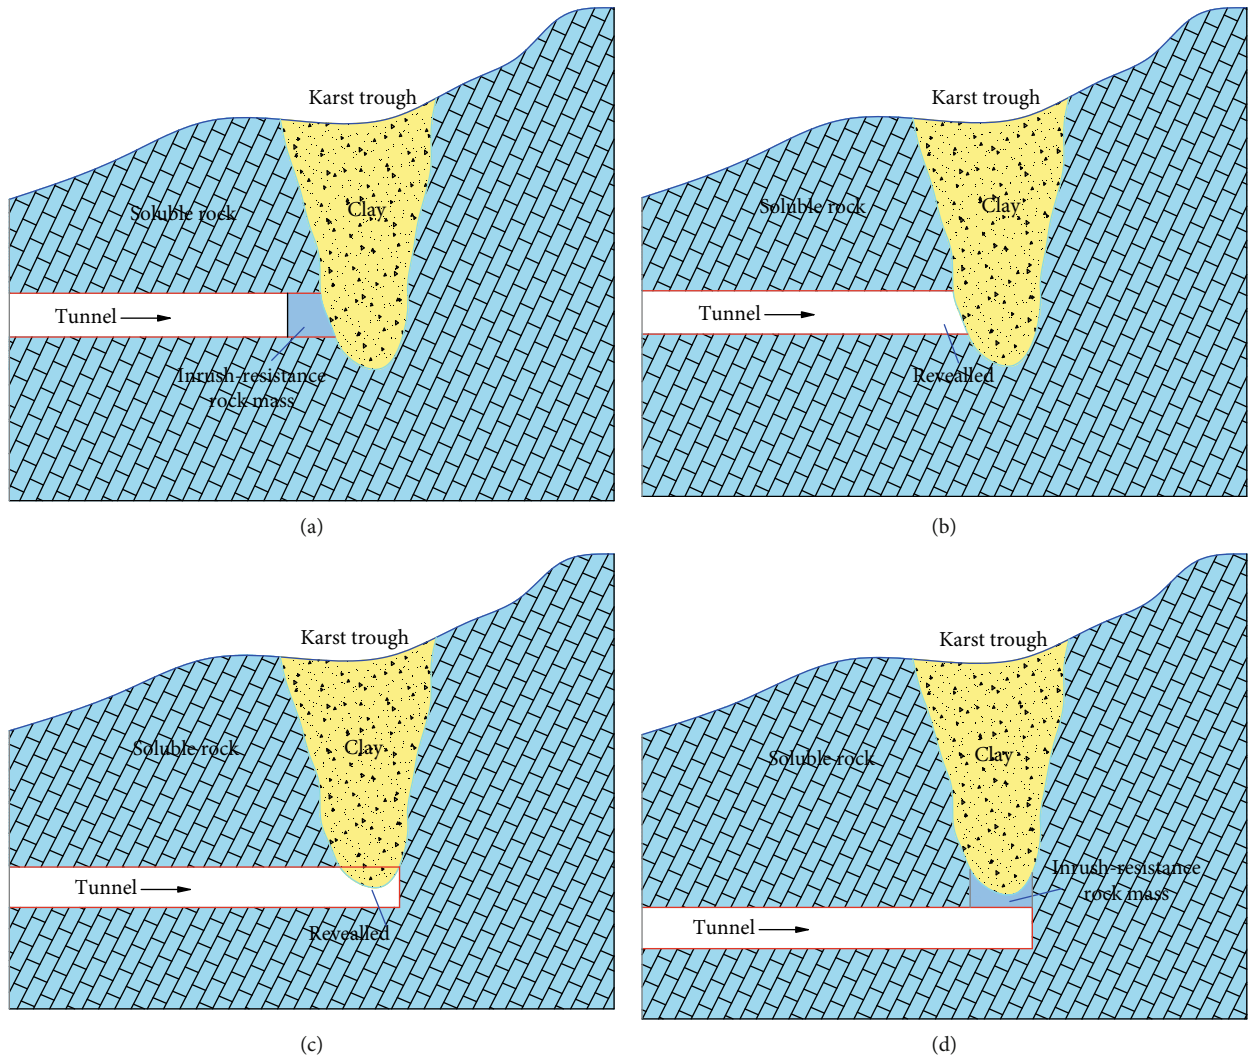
Collapse and mud inrush mode of the filled karst trough: (a) rock mass failure of tunnel face; (b) direct exposure of tunnel face; (c) direct exposure of tunnel roof; (d) rock mass failure of tunnel roof.
